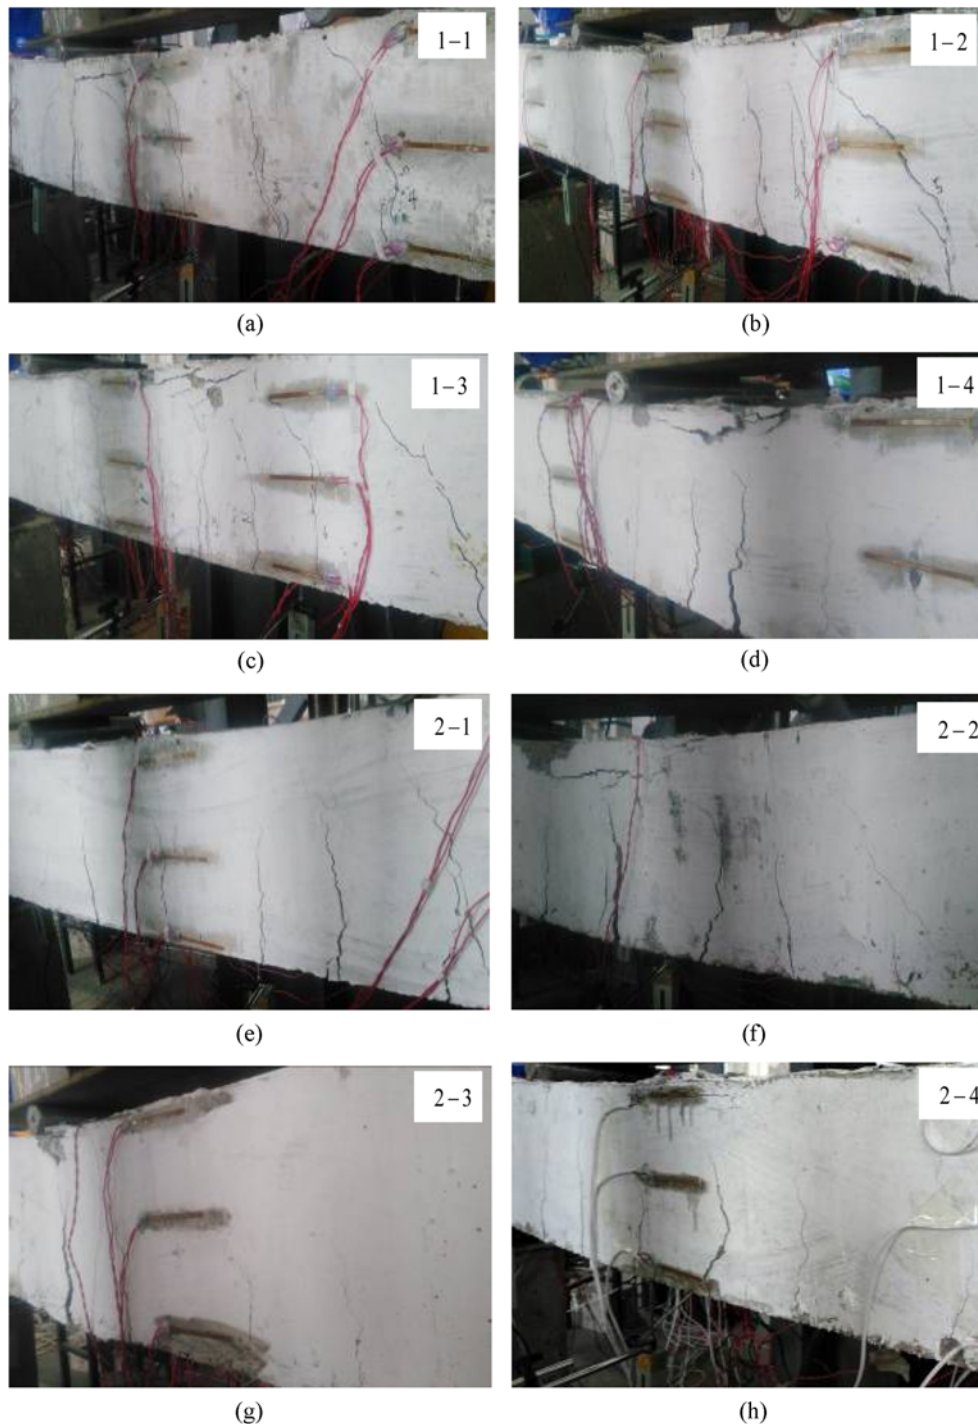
Failure Patterns of the Specimens: (a) PCB1-1, (b) PCB1-2, (c) PCB1-3, (d) PCB1-4, (e) PCB2-1, (f) PCB2-2, (g) PCB2-3, (h) PCB2-4
